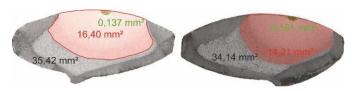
Fracture surfaces of two prestressing wires after a fatigue test. Green: pre-existing defects, red: crack propagation during the fatigue test, light gray: residual fracture surface [6].
